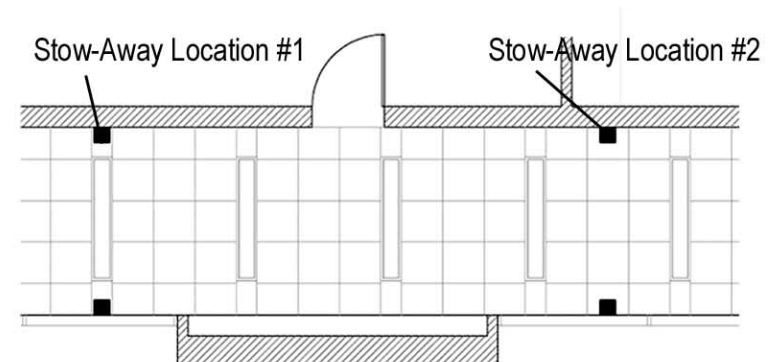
A: Reflected ceiling plan showing spacing of artificial lighting, windows separating corridor and gymnasium, and placement of Stow-Away's.
